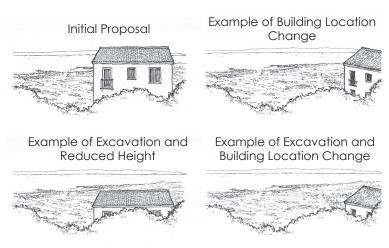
Examples of Building Excavation and Location Changes to Reduce View Impacts
